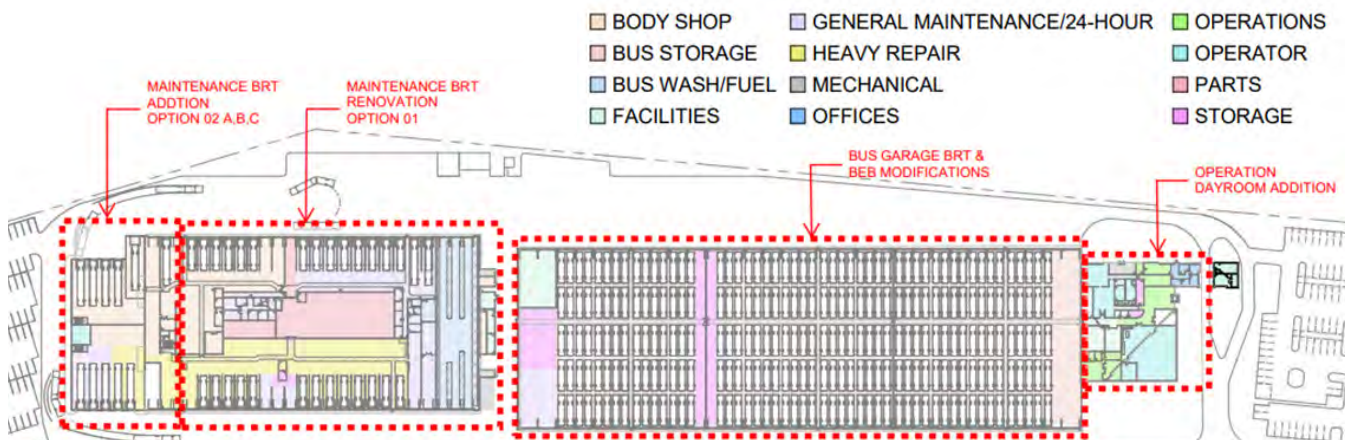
Queensgate Site Renovation and Expansion Site Plan
